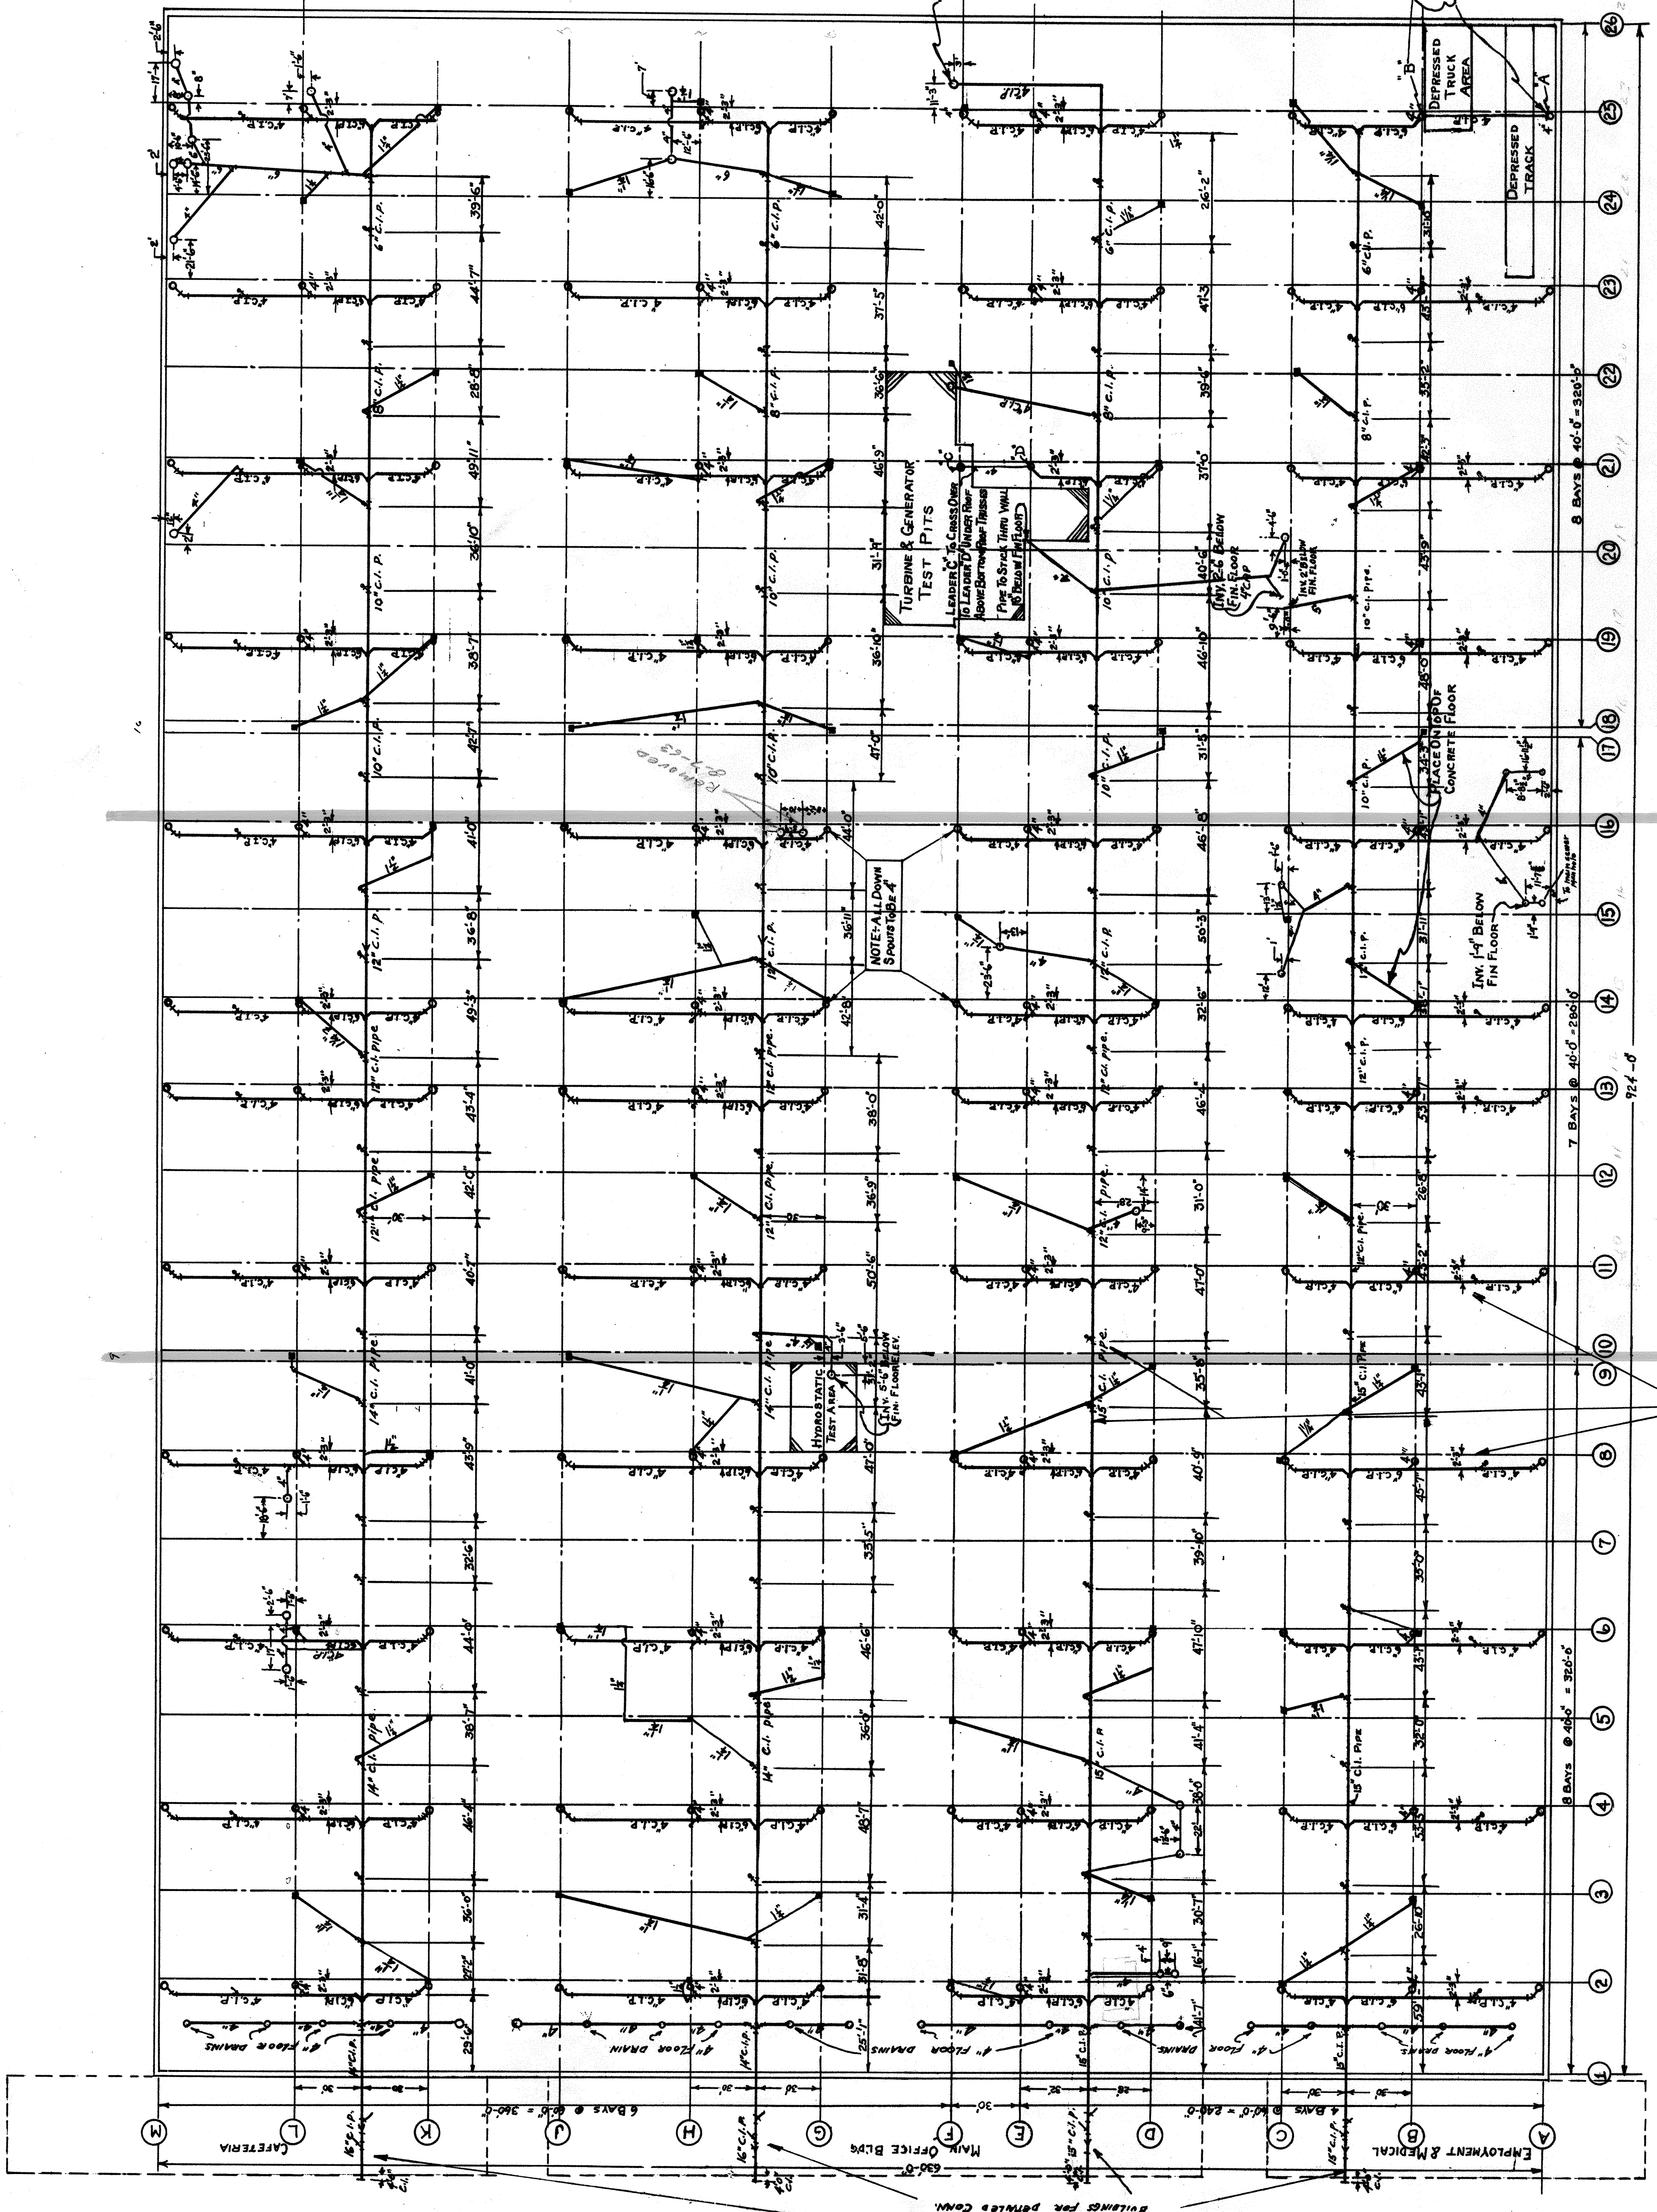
SUBSTATION T3 APPENDIX A - BLDG TR-1 FLOORING REMOVAL DETAILS (1995) CARRIER FACILITY, THOMPSON ROAD SYRACUSE, NEW YORK
